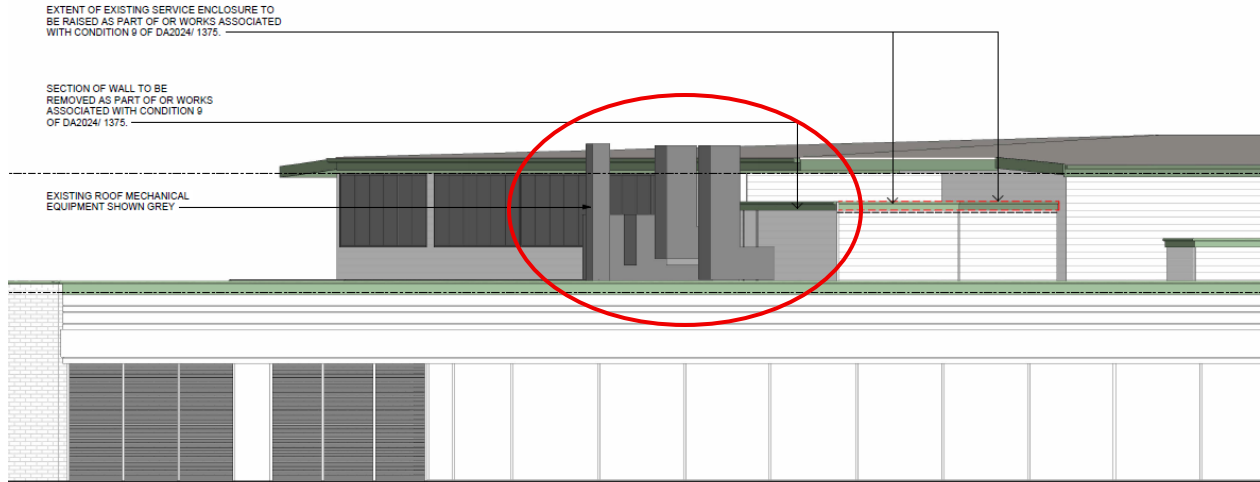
Existing elevation drawing showing existing mechanical services (red circle). Source: Little Boat Projects, Drawing No. D.05.030, rev D3.
